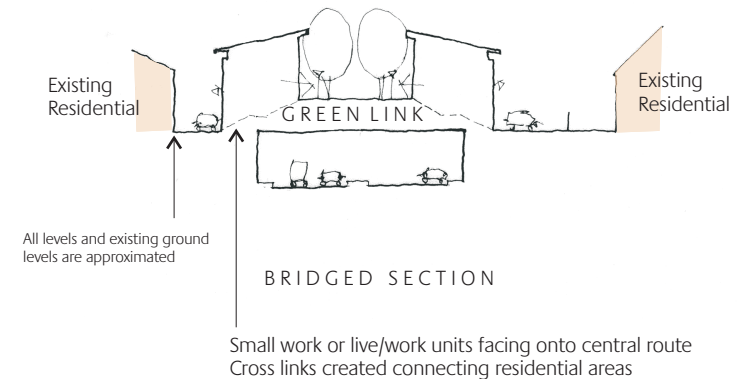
The Boulevard Indicative Section Area B, showing potential to bridge the road at narrowest point.
